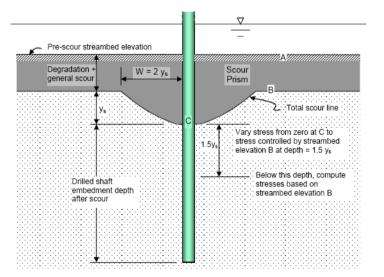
The effect of scour on bridge foundations (AASHTO LRFD Bridge DesignSpecifications, 2007).
